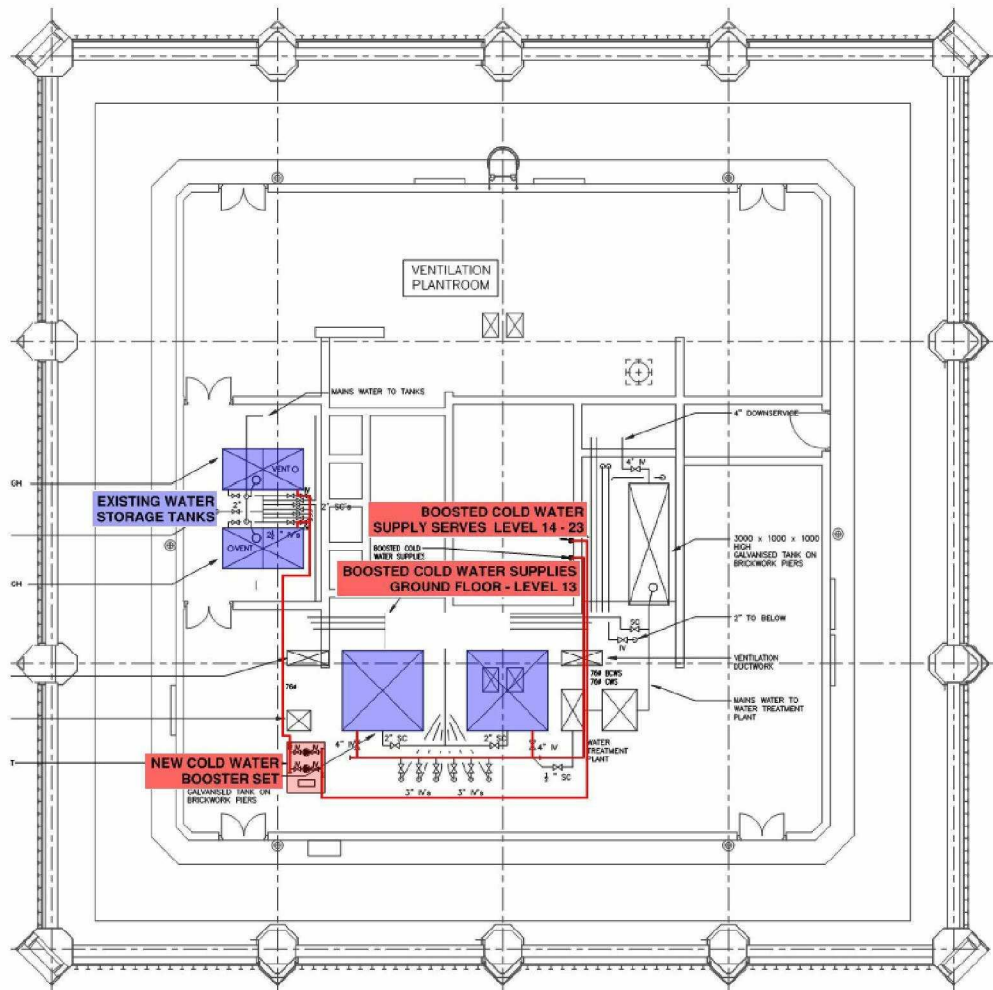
Refurbishment works to boosted cold water distribution system on Roof Plant Room. (RYD00000577)
